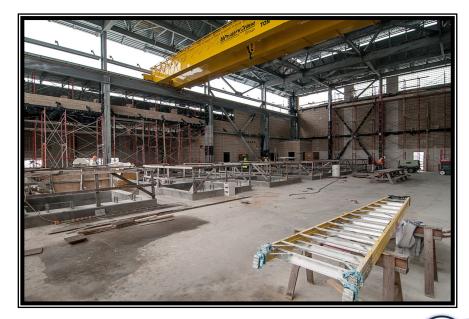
Surface Water Facilities (SWF) Construction Photos
